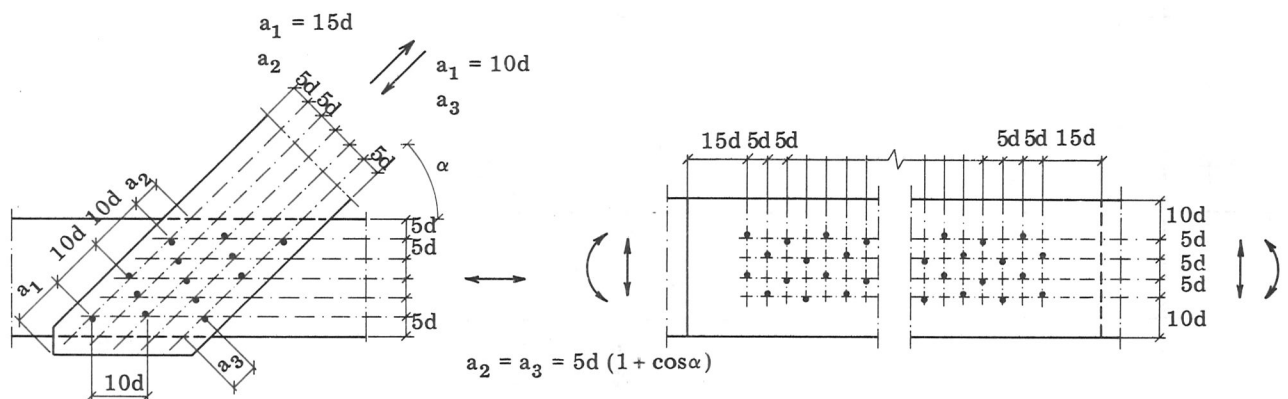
Minimum distances for timber-to-timber joints.
